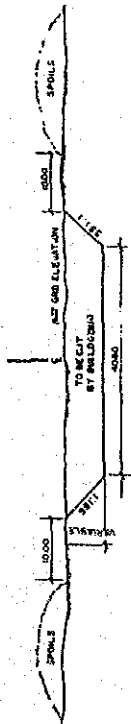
TYPICAL CROSS SECTIONS OF EXISTING DIKE (1/4)
